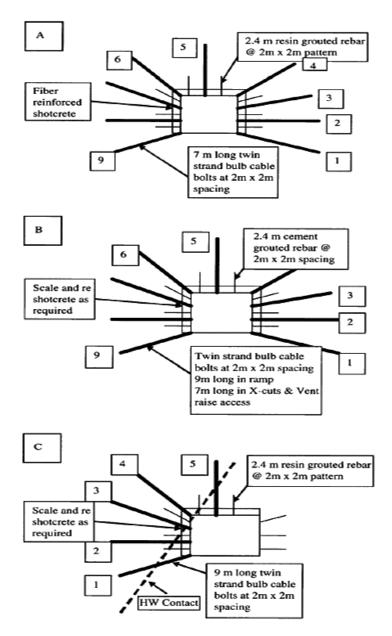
(a) Waste development rehabilitation standard (b) New waste development support standard (c) Ore HW access drift support rehabilitation and new. Using resin or cement grouted rebar bolting as a primary means of support in major long-term ore and waste development drifts and in rehab areas.
